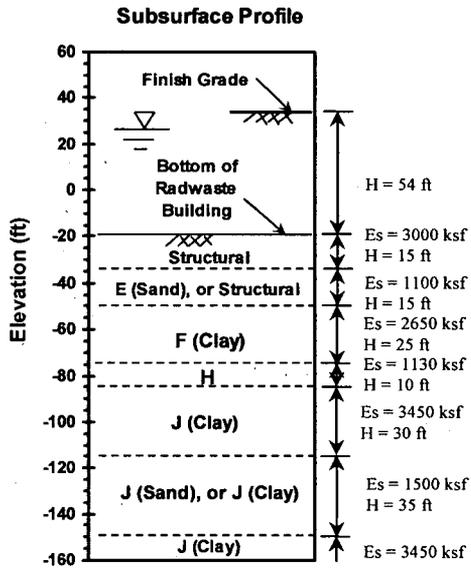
Subsurface Profile at Unit 4 Radwaste Building
